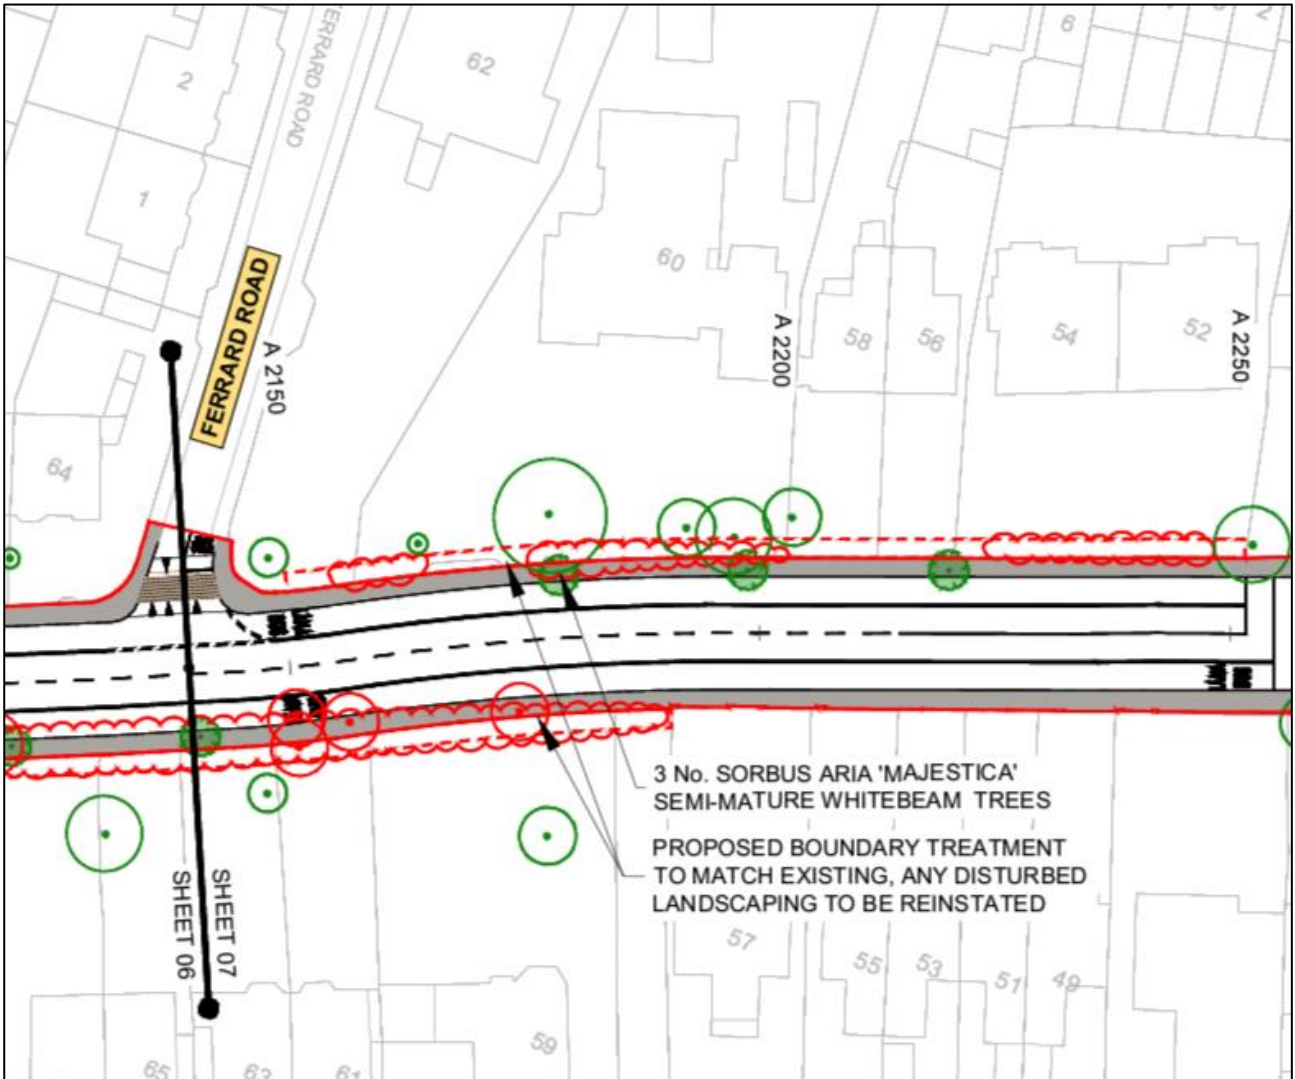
Landscape General Arrangement Drawings at Terenure Road East
